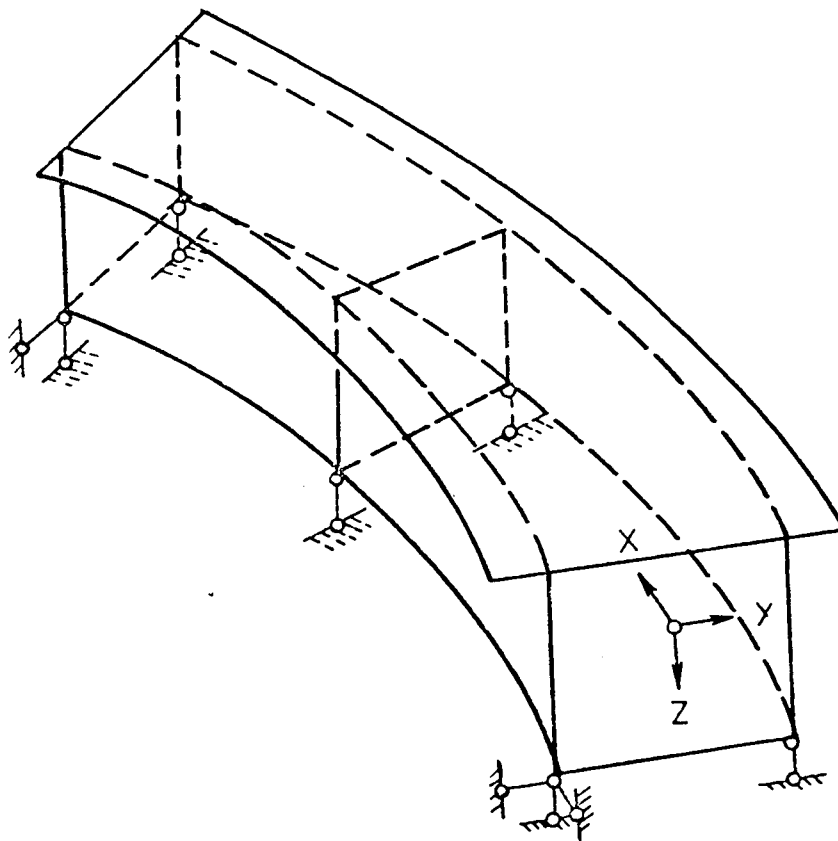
Curved Box Girder Bridge Continuous over Two Spans
